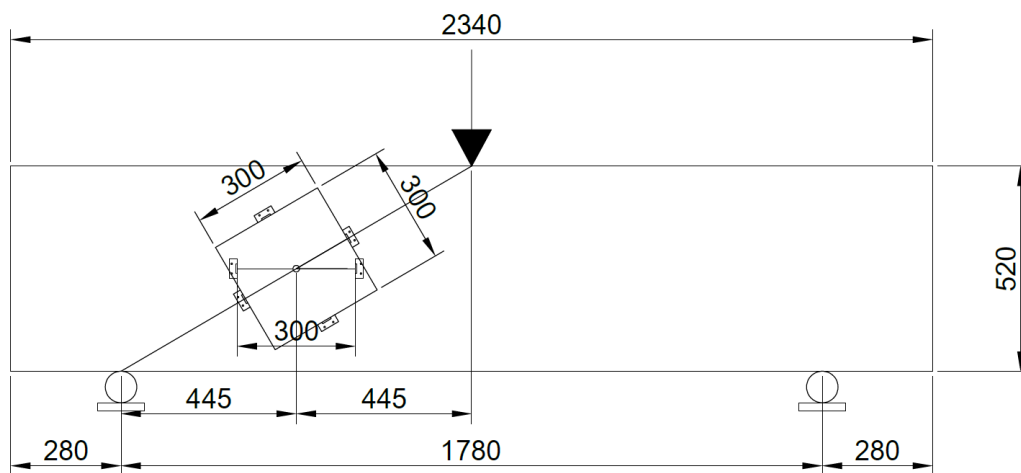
Surface Mounted Displacement Measuring Instrument Setup
